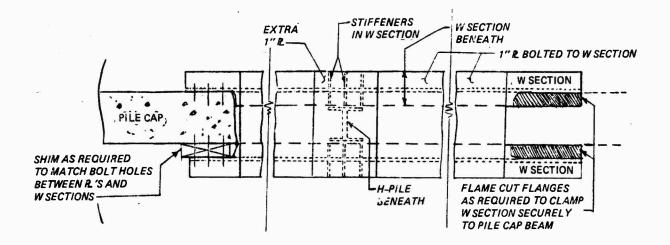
Steel plate reinforced with steel beams (Repair for Case 3 damage, 60 ft of steel beam required, 3 plates, 8- by 30-ft, 1 in. thick required (Reinforced plate subconcept)
